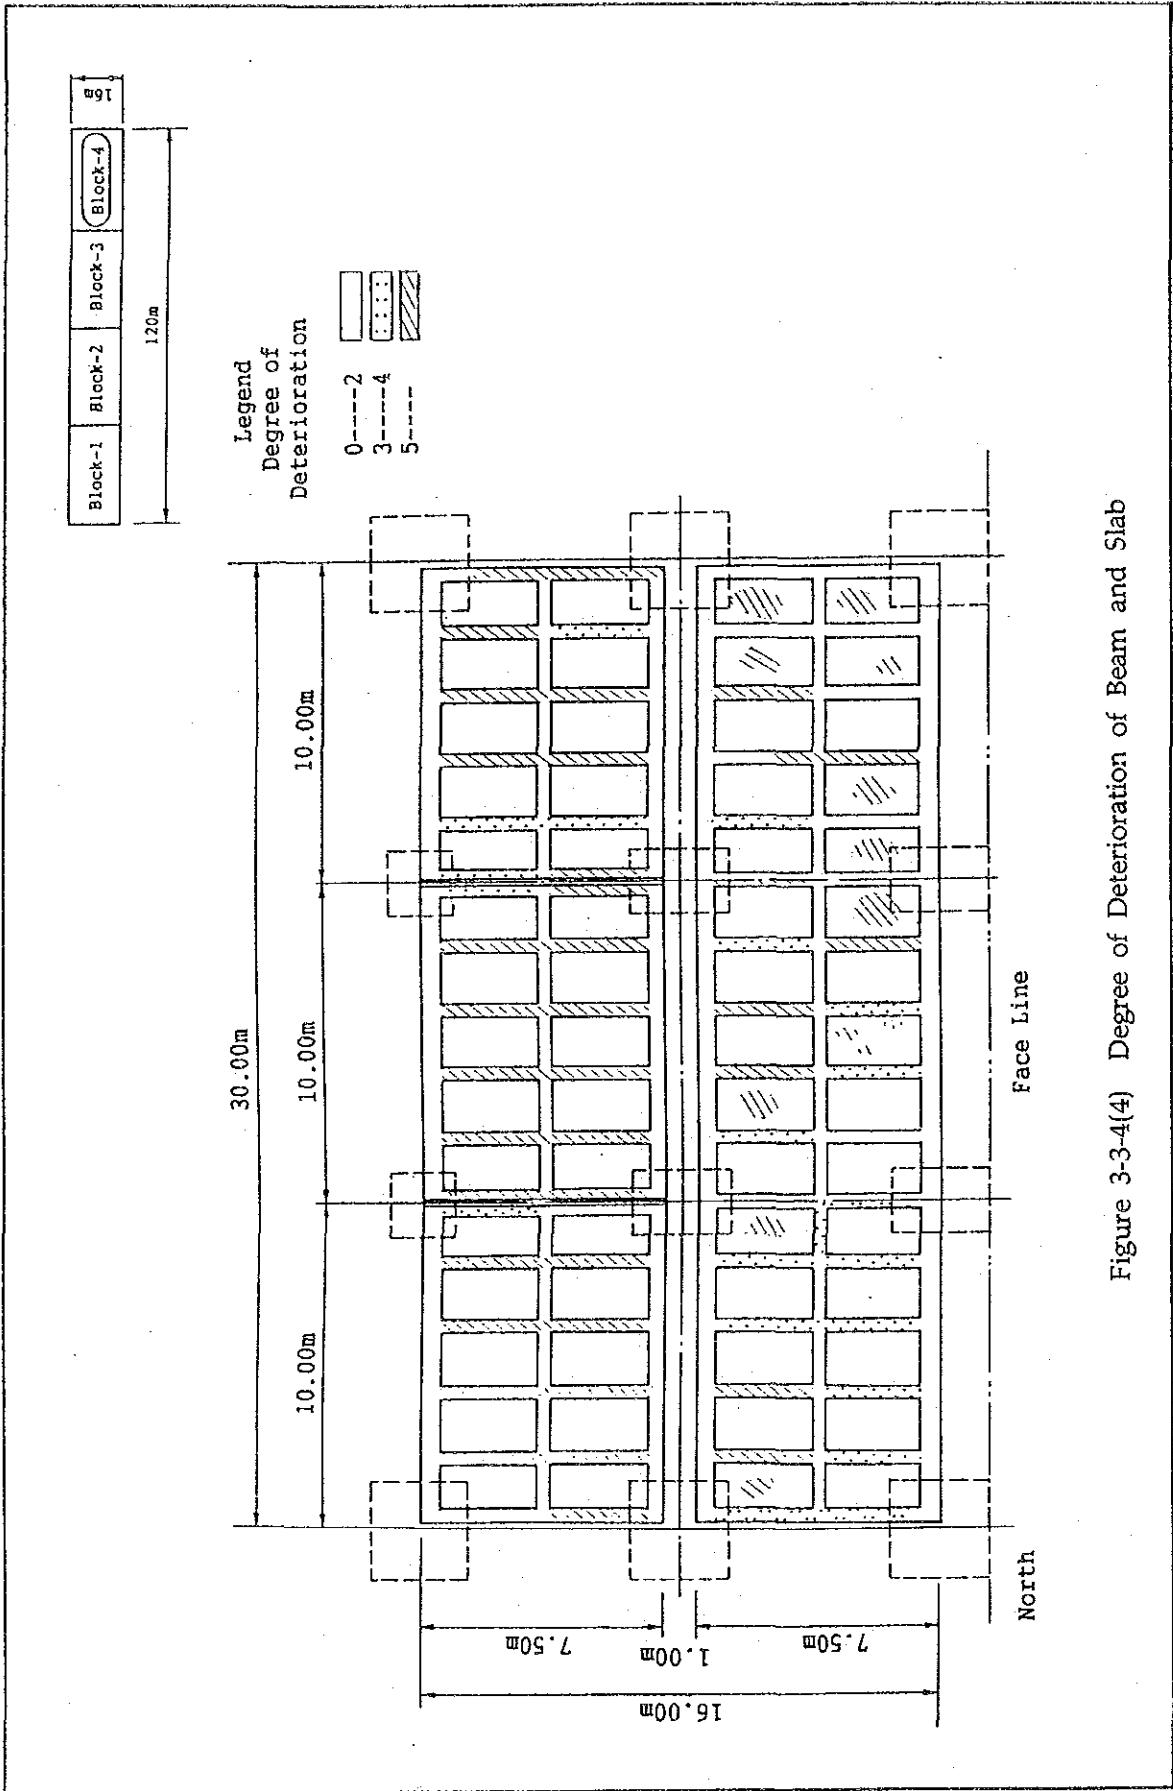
(4) Degree of Deterioration of Beam and Slab
